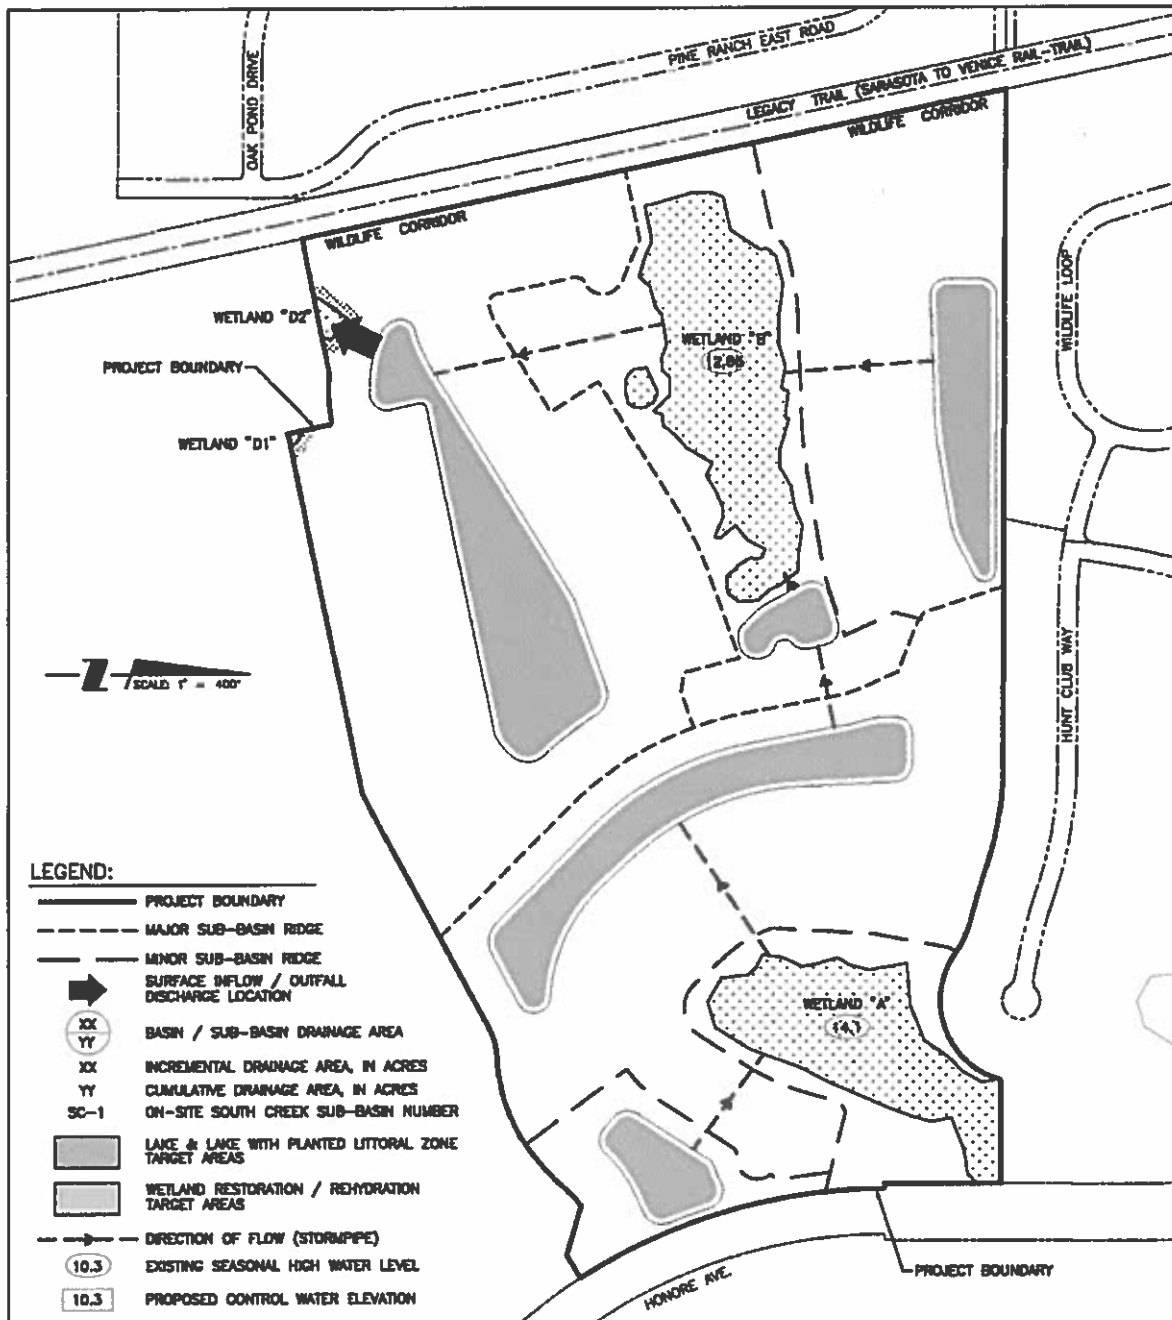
EXHIBIT E – WILDLIFE CORRIDOR PLAN (G-1)
